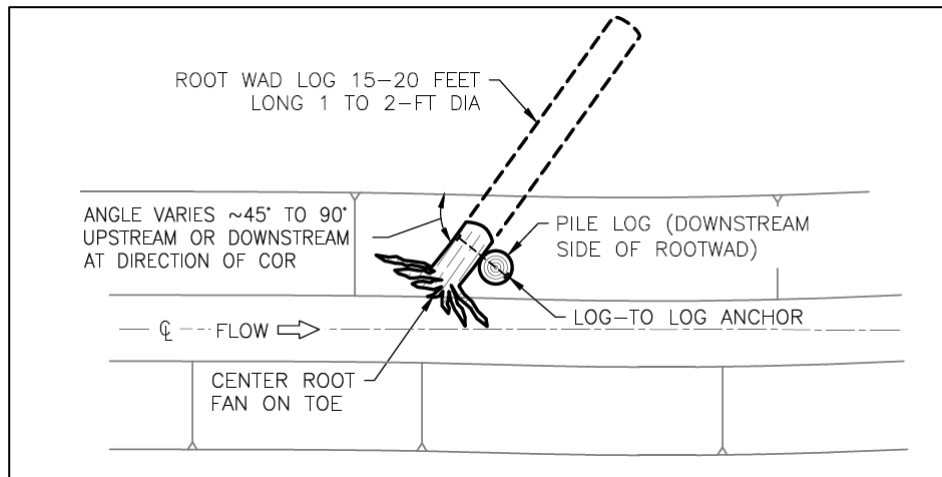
Typical plan view of a root wad anchored with a log pile on the downstream side.
